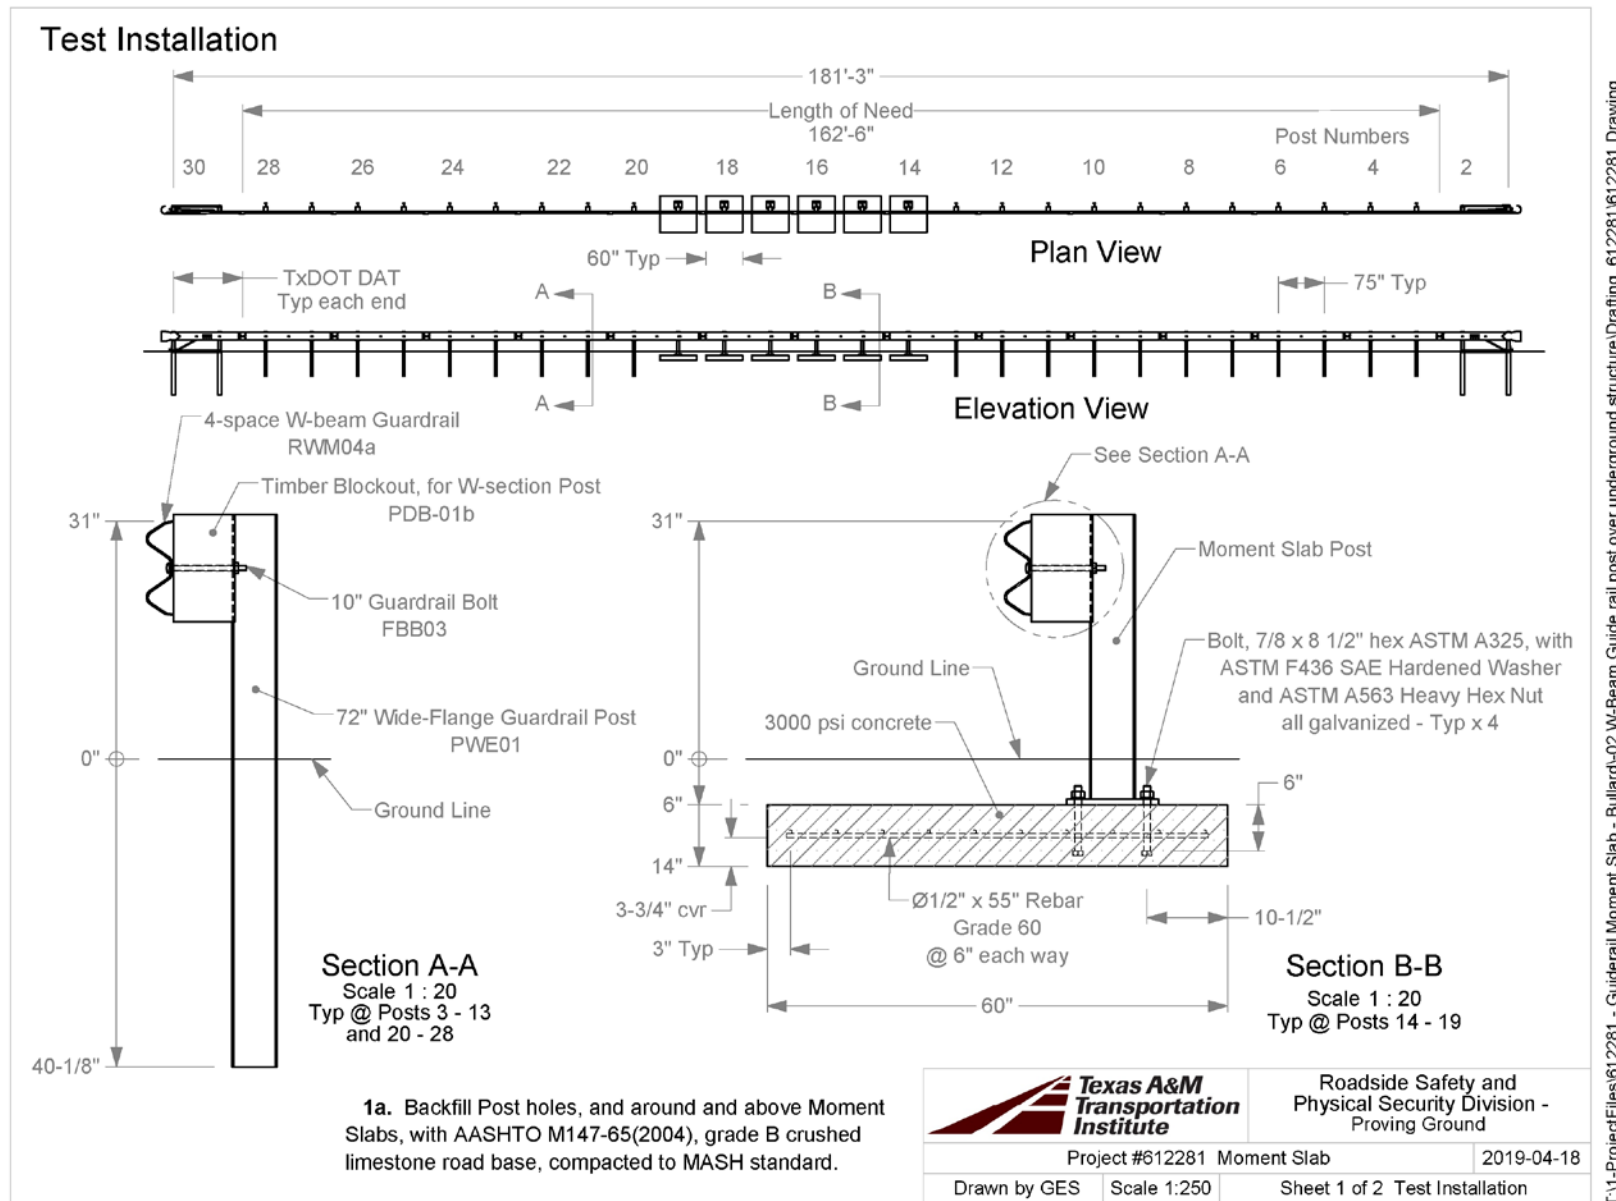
presents overall information on the W-Beam Guiderrail over Underground Structure, and Figure 2.2 provides photographs of the installation. Appendix A provides further details of the W-Beam Guiderrail over Underground Structure.
